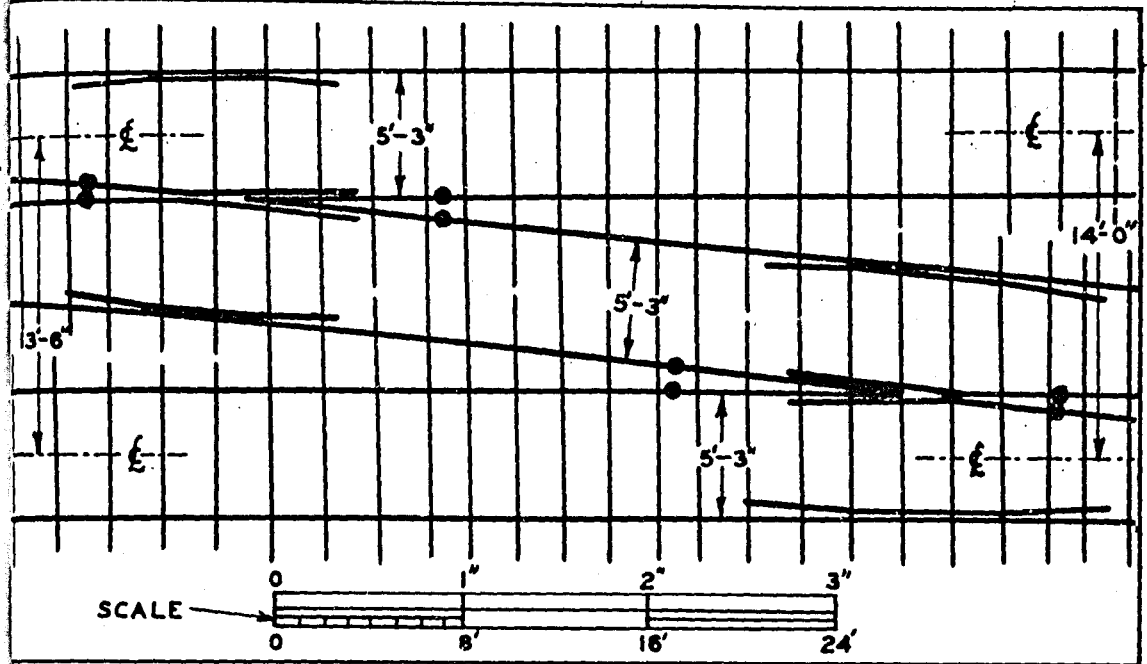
PORTION OF TIMBER PLAN - SCALE: 8'-0" TO 1"
